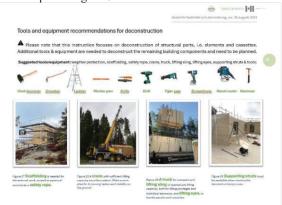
A guide for adaptability, deconstruction and reconstruction was developed for the Adaptability building.
